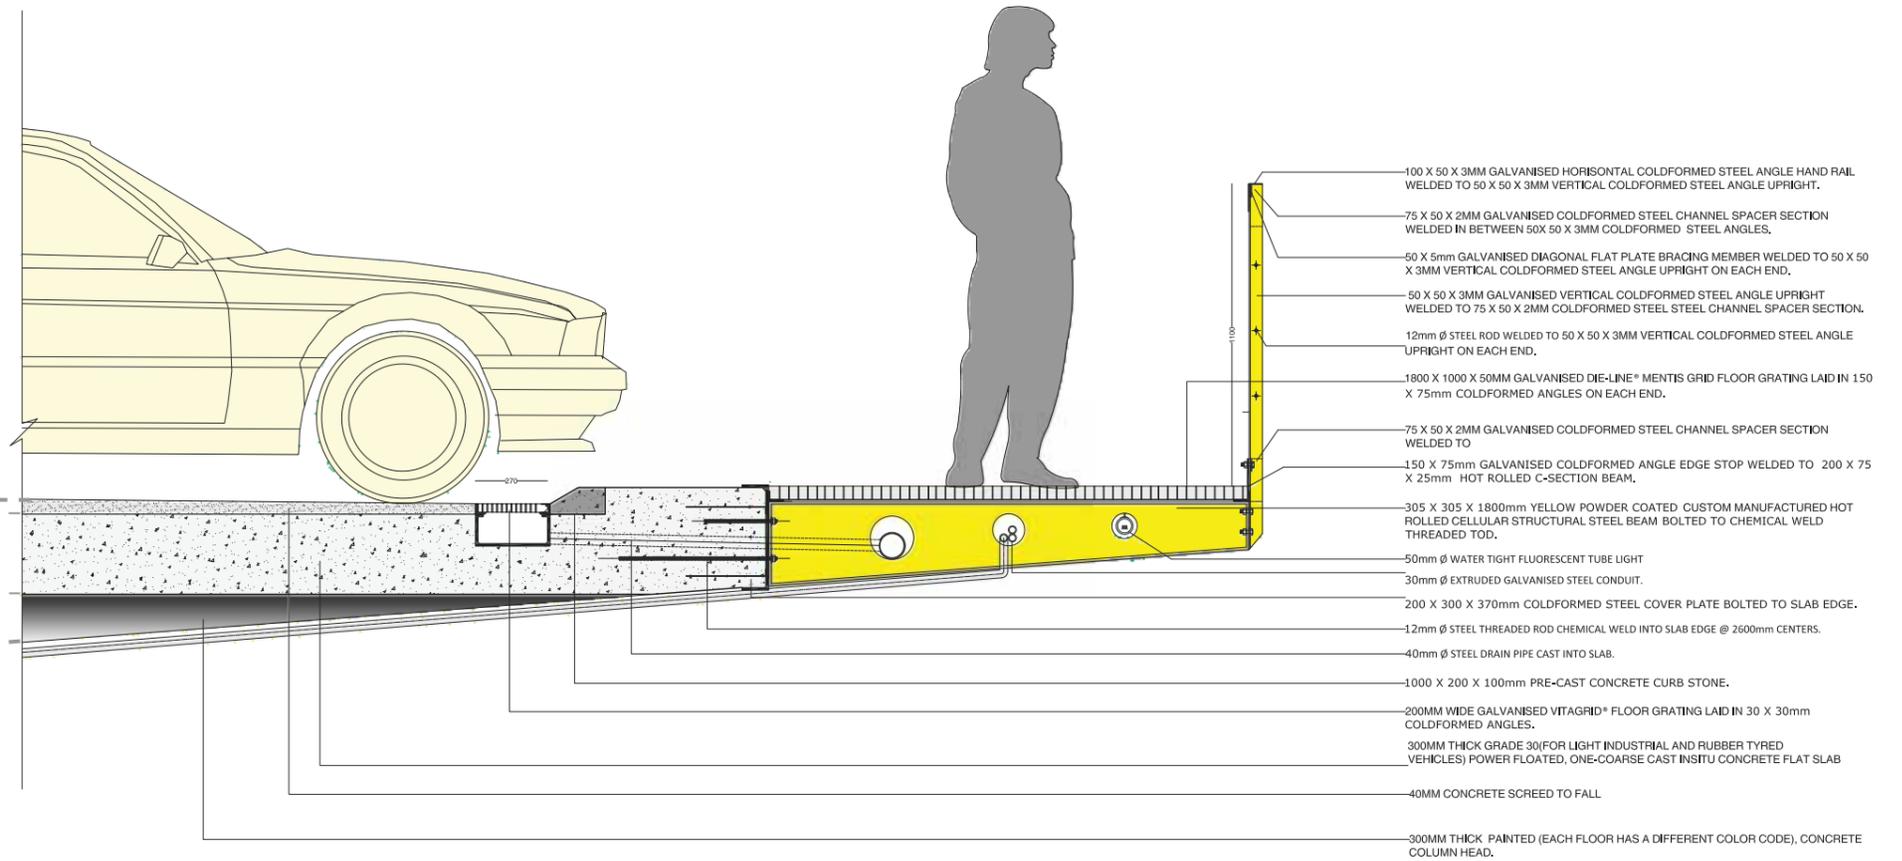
Development of the walkway connection. Custom made I-section beams fixed to chemical weld pin connection to slab on either side. Balustrade uprights fixed to flat plate welded to capped I-section beam, mentis grid walkway fixed to custom I-section beams.
